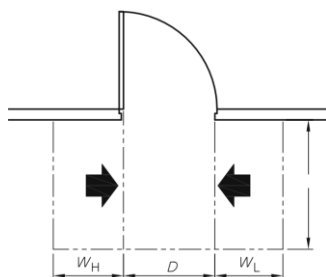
Circulation Space at Swing Doors – Door Opens Toward User
